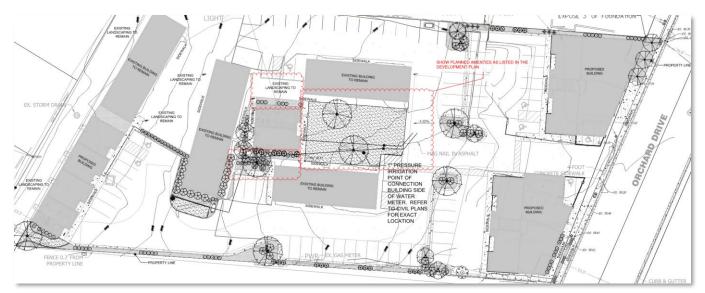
Hidden Gardens Landscape Plan, Sheet L-1
